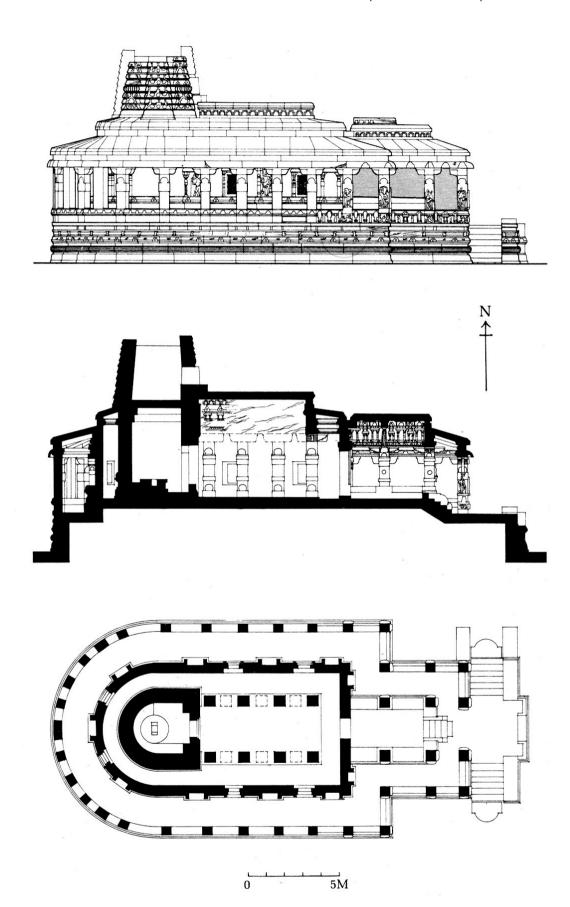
Elevation, section and plan of *Durga Temple* at Aihole, Karnataka, India.
